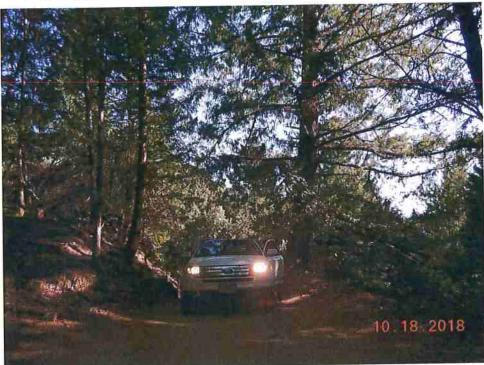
RP9. Pinch point and sight distance restriction. Turnout provided. Facing north.
